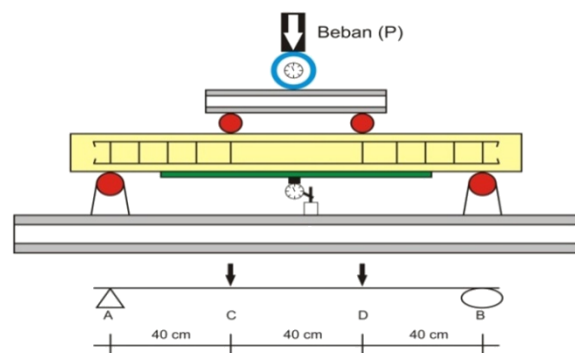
Set-up testing on reinforced concrete beams in bending test.
